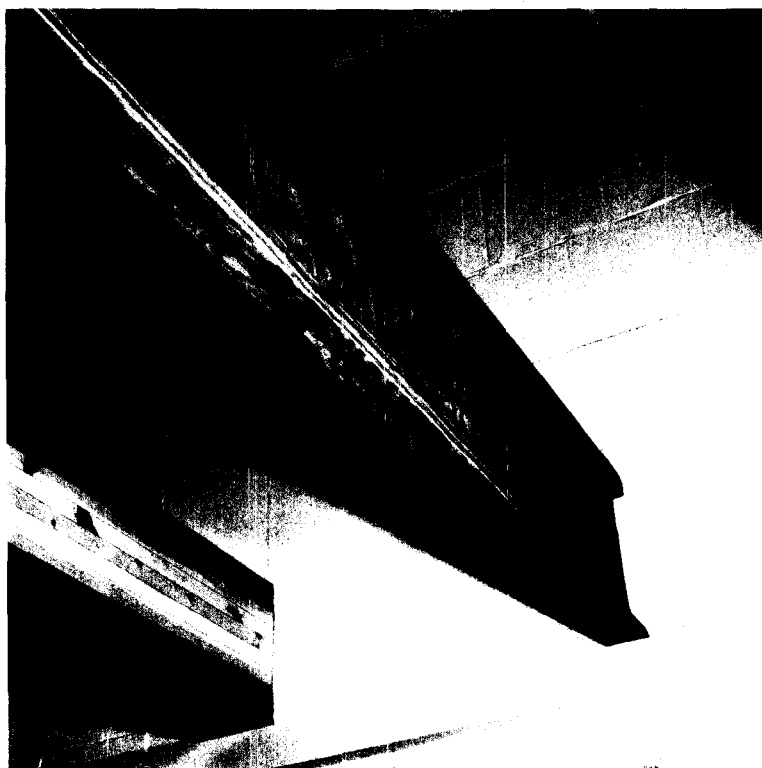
Plywood-webbed I-beam with laminated veneer lumber flanges (display beam at U.S. FPL).
